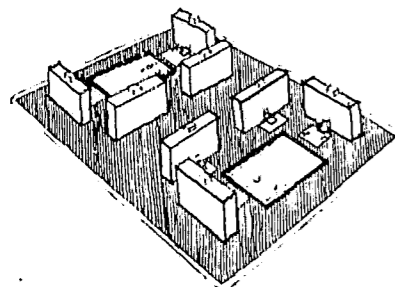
Housing project site plan in which teen play facilities are bordered on three sides by buildings and entries.
